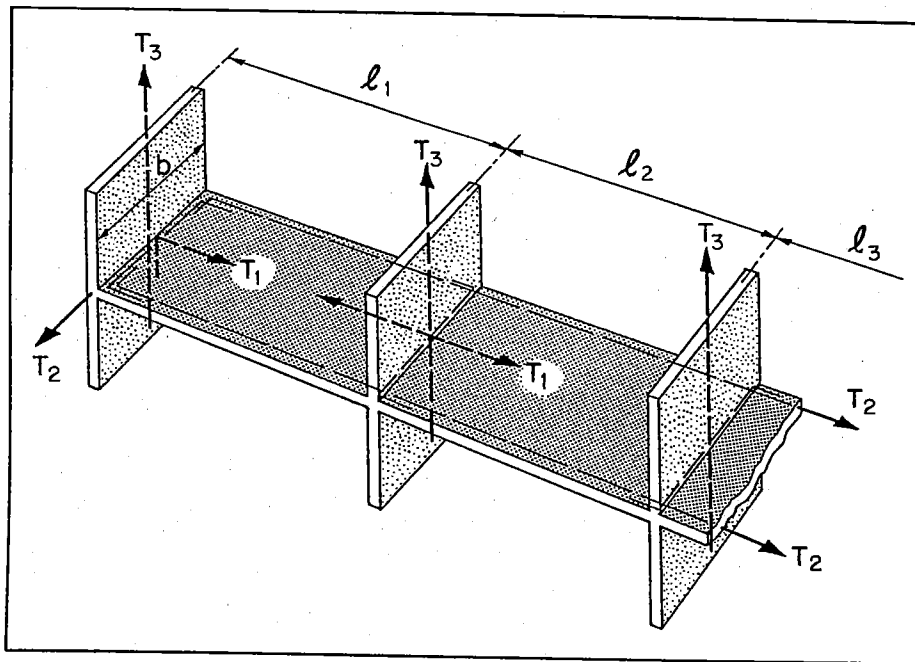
Recommended tie forces in precast concrete bearing wall buildings.
